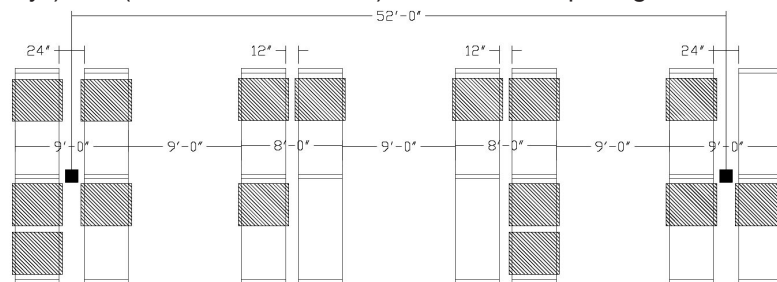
Optimal Column Spacing Example (Parallel to Aisles)
